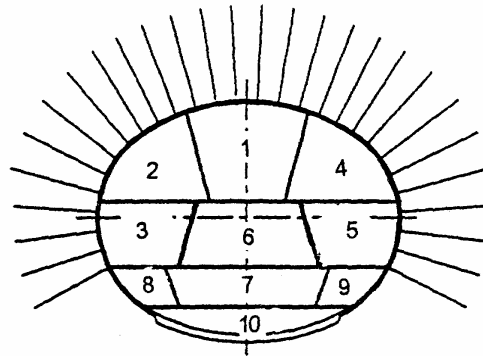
Top heading and bench method of excavation. Temporary support consists of a 200 mm thick shotcrete shell with 4 and 6 m long untensioned grouted rockbolts at 1.0 - 1.5 m spacing.
